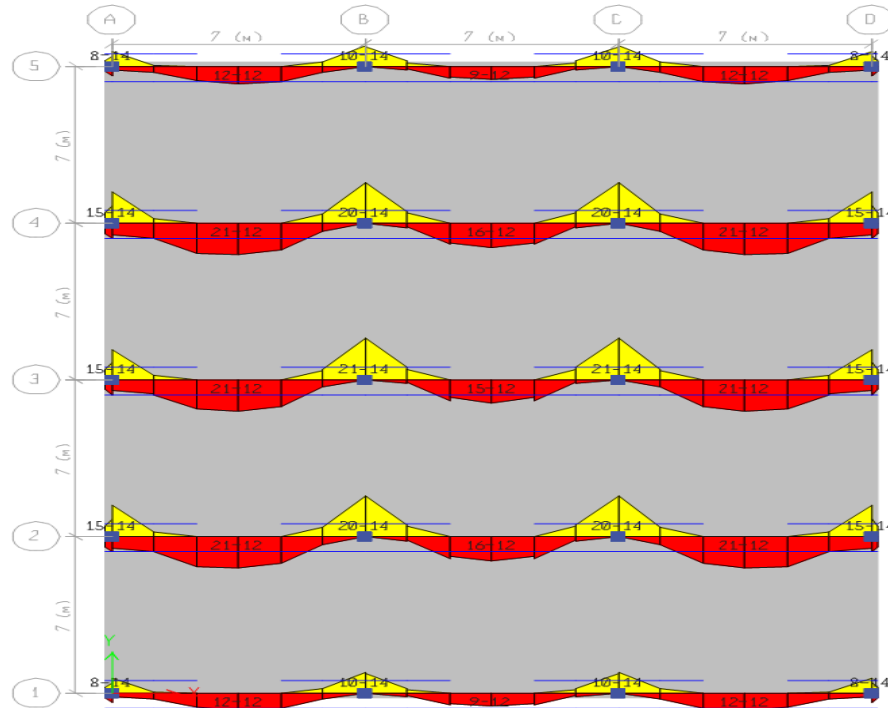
R.C flat slab Top and Bottom reinforcement layout in layer A strip direction
